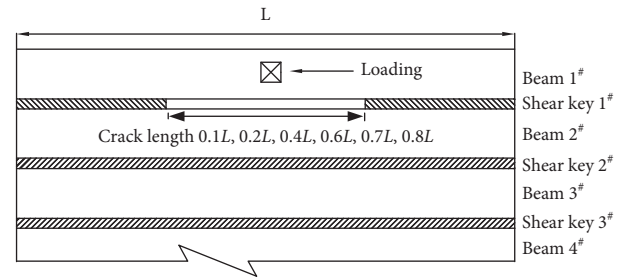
Loading scheme of the model bridge with edge shear key (#1) cracks.
